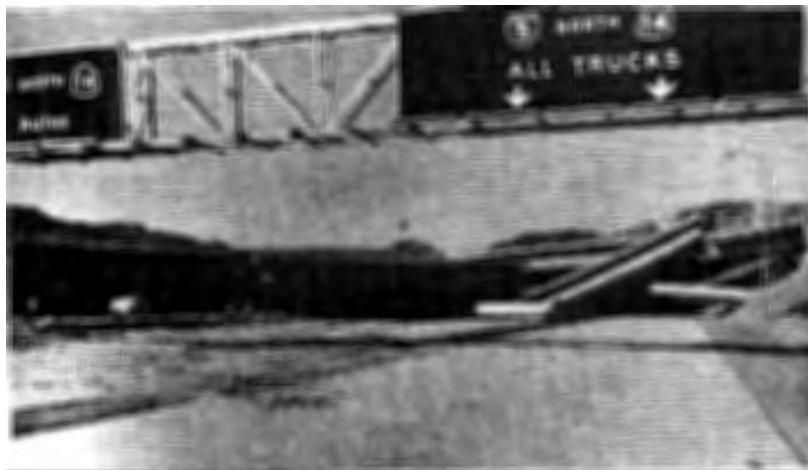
Route 5/210 Interchange Separation and Overhead bridge. Portion of collapsed superstructure. Columns from left to right are Piers 5, 6, and 7. California Division of Highways, Bridge Department photograph.
